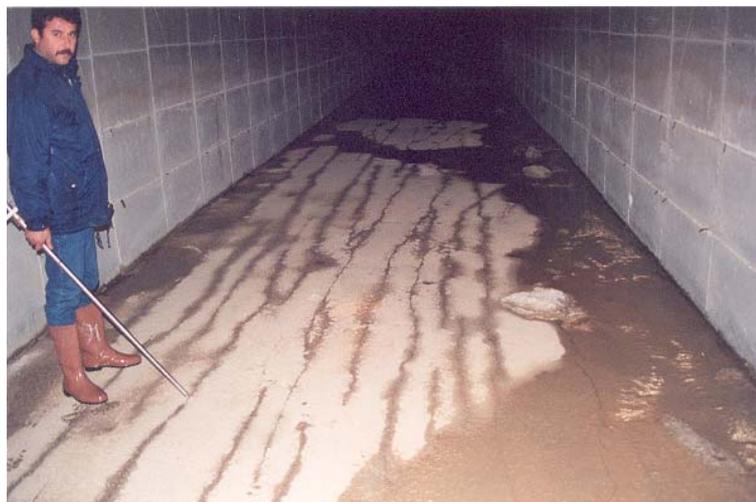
Floor cracks formed between stations Y5 and Y6
